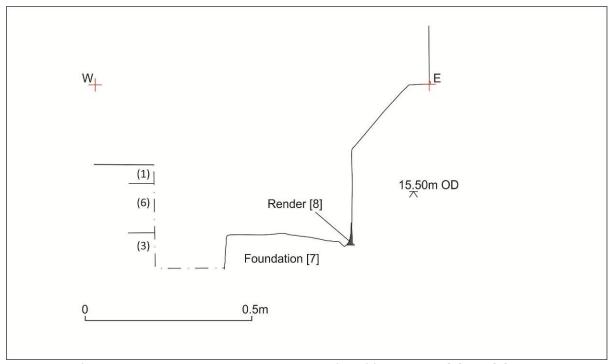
South facing section across Trench 1 showing profile of foundations [4] and [7]
